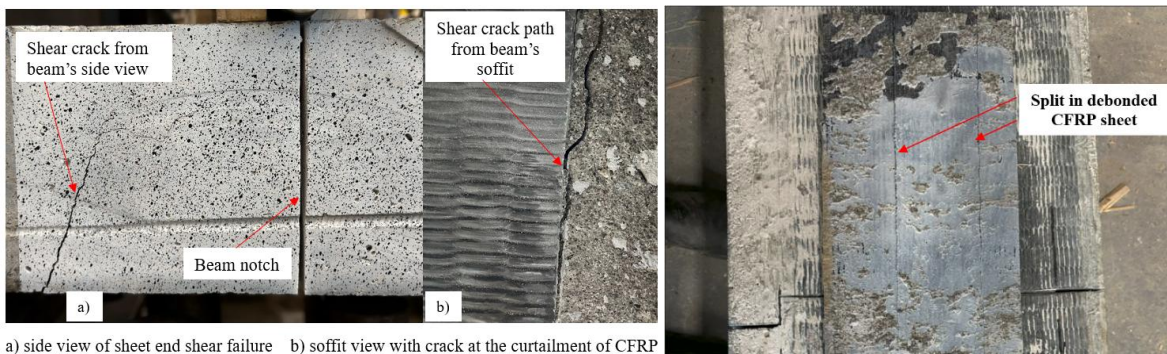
Typical CFRP failure modes a) Sheet end shear failure; b) Interfacial debonding surface from beam B4S1-L700 with split in fibre direction
